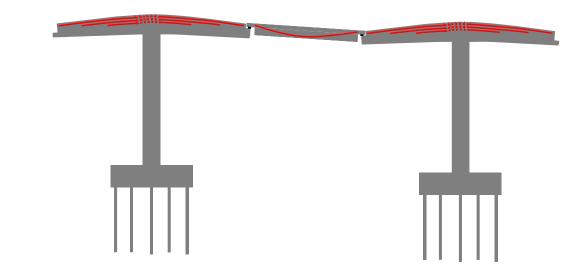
Current deteriorated condition of the cantilevers of the bridge after 48 years of service. The sketch shows the corrosion of the tendons above the piers (hypothesis based on extensive cracking observed on the locations) and the deflection of the deck (measured on a point cloud).
